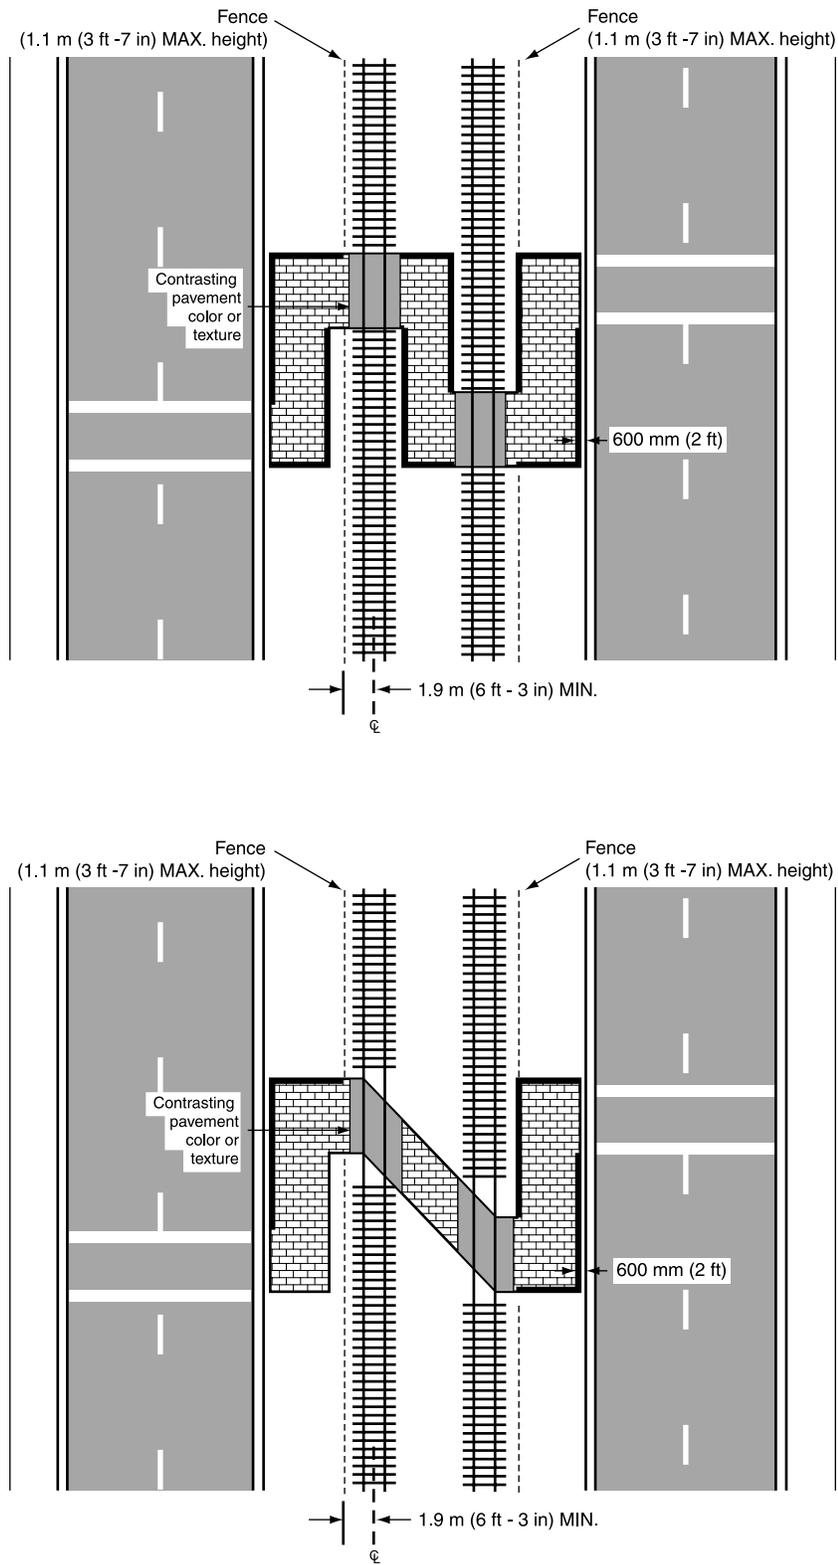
D-8. Typical Examples of Pedestrian Barrier Installation at an Offset Nonintersection Light Rail Transit Crossing
